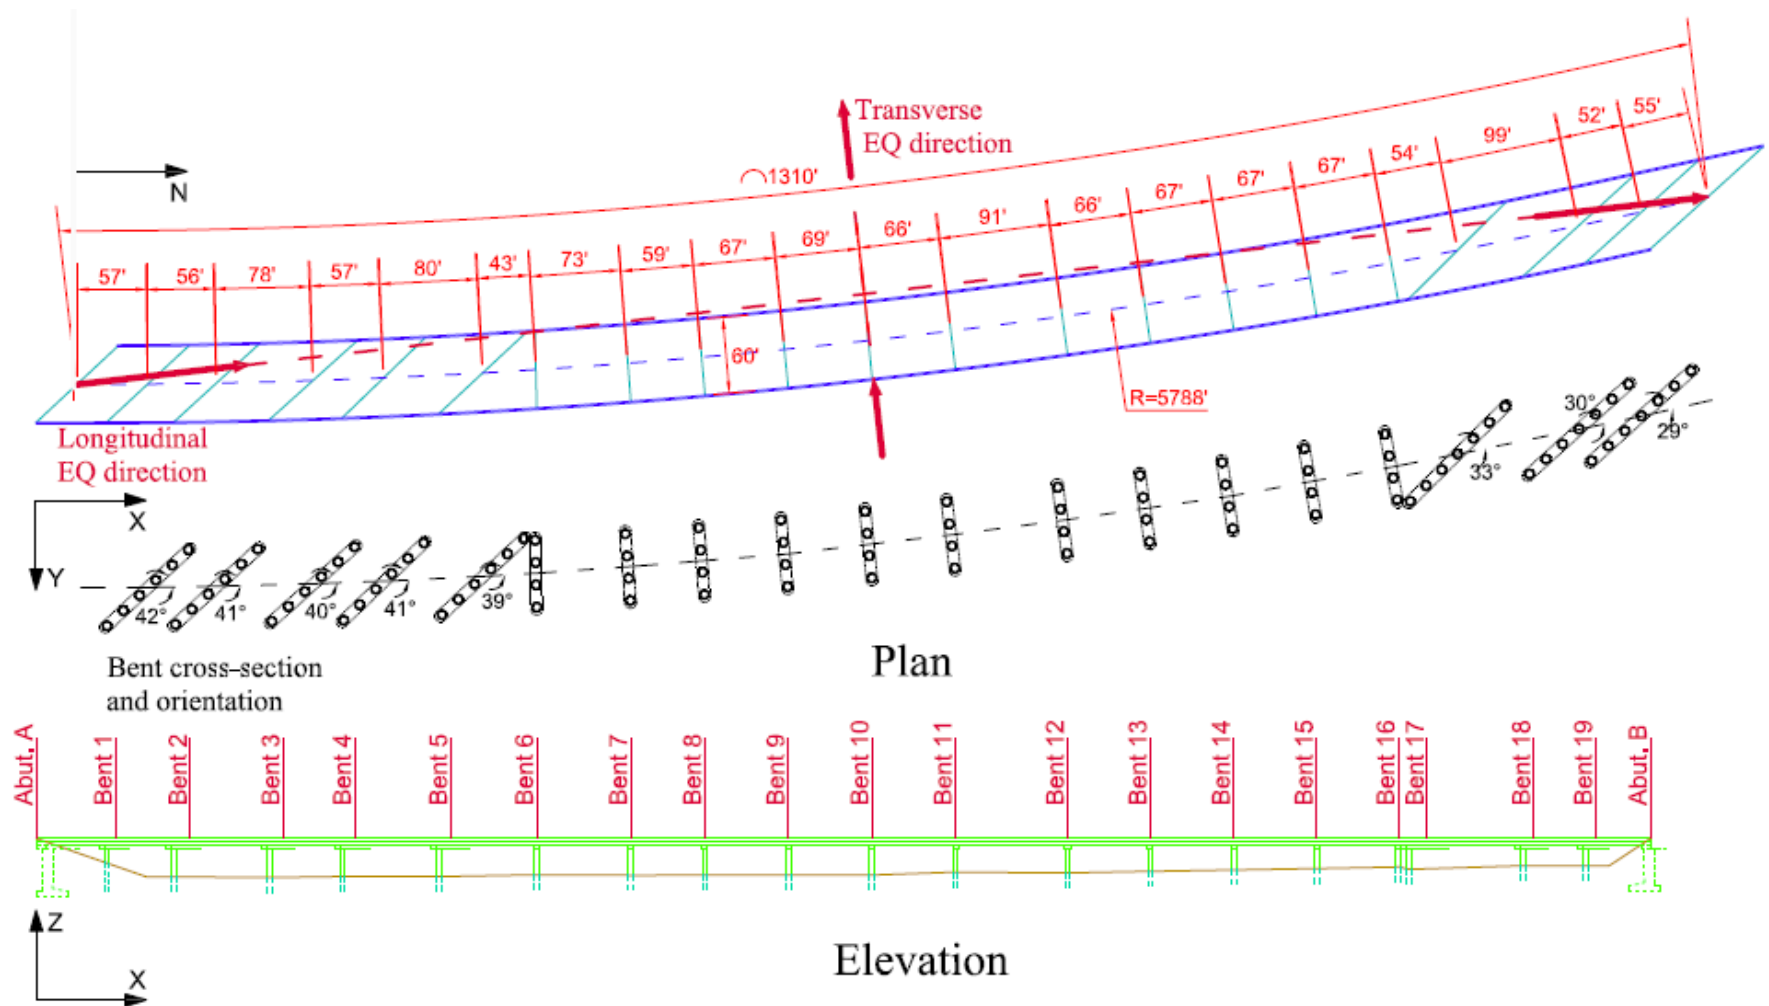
Elevation and plan view of I-5 Ravenna Bridge
